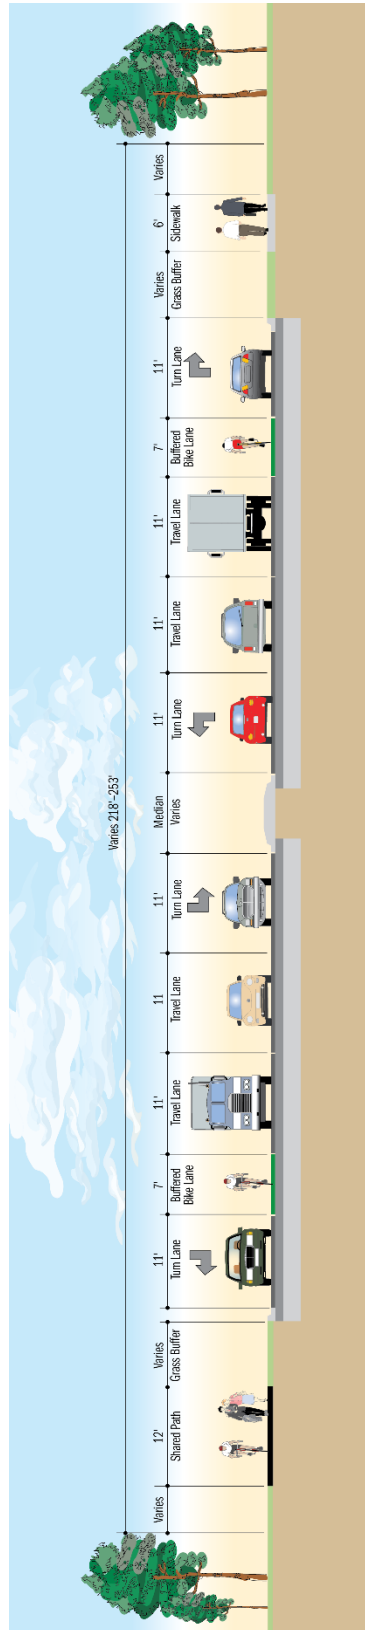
Segment 4 – Coventry Court to west of Industry Road Typical Section
